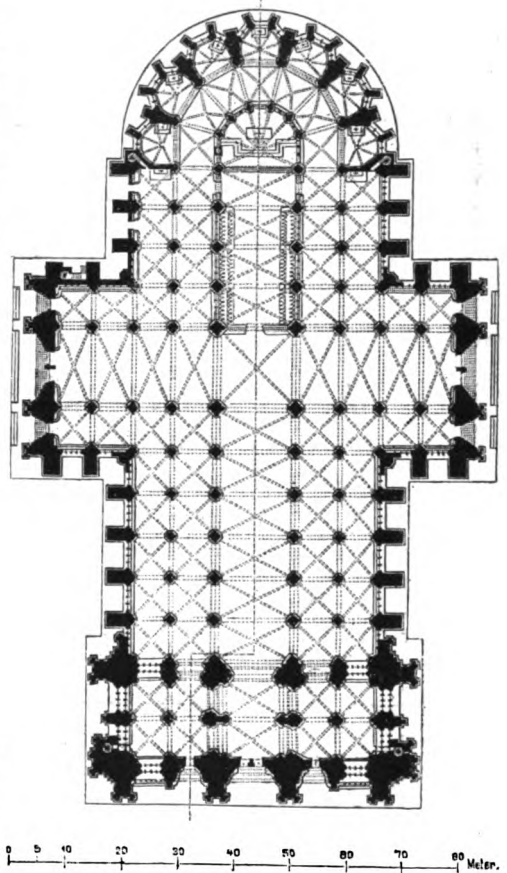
CATHEDRAL OF COLOGNE, GERMANY. FRANCO-GERMAN GOTHIC PLAN. GOOD EXAMPLE OF FULLY DEVELOPED RITUAL PLAN.
